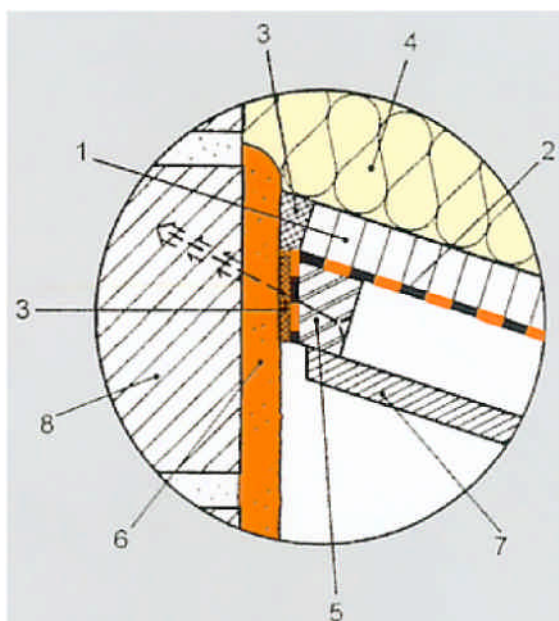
Window, airtight connection. Brickwork with heat insulation and external ventilated covering.
